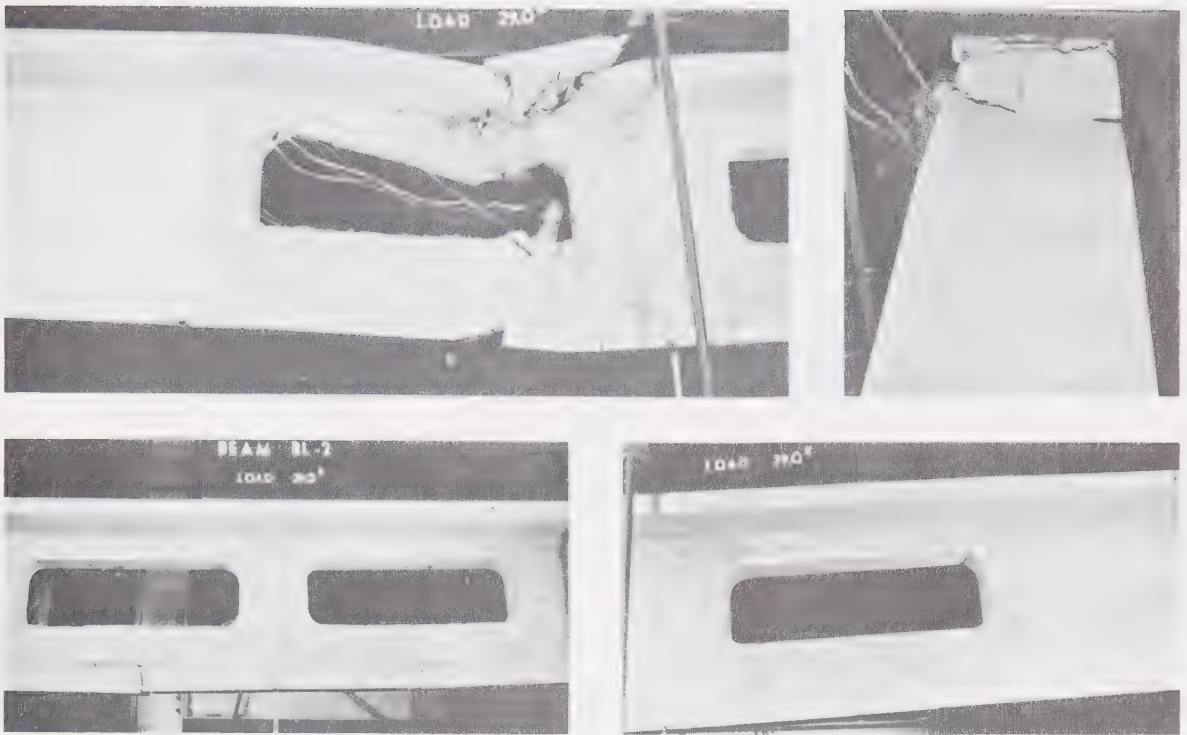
CRACKING AND FAILURE PATTERN OF BEAM 21-26-5
